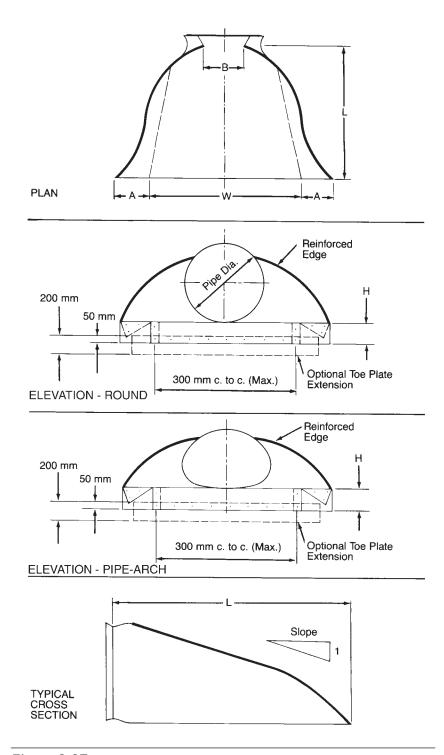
Details of end sections in round and pipe-arch shapes.
